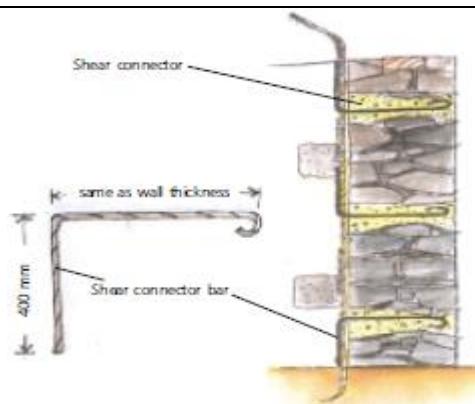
shear connector with vertical bar details (source: UNDP, UNECO & GOI, 2007)
